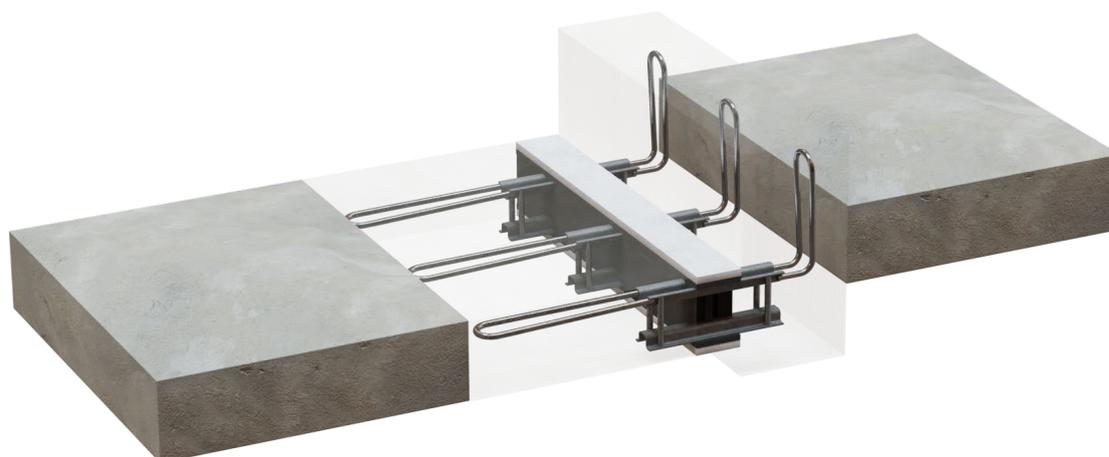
The TIPOMEGA® connector anchored in the beam using UG3-shaped bars, welded to the upper profile and bent upwards
